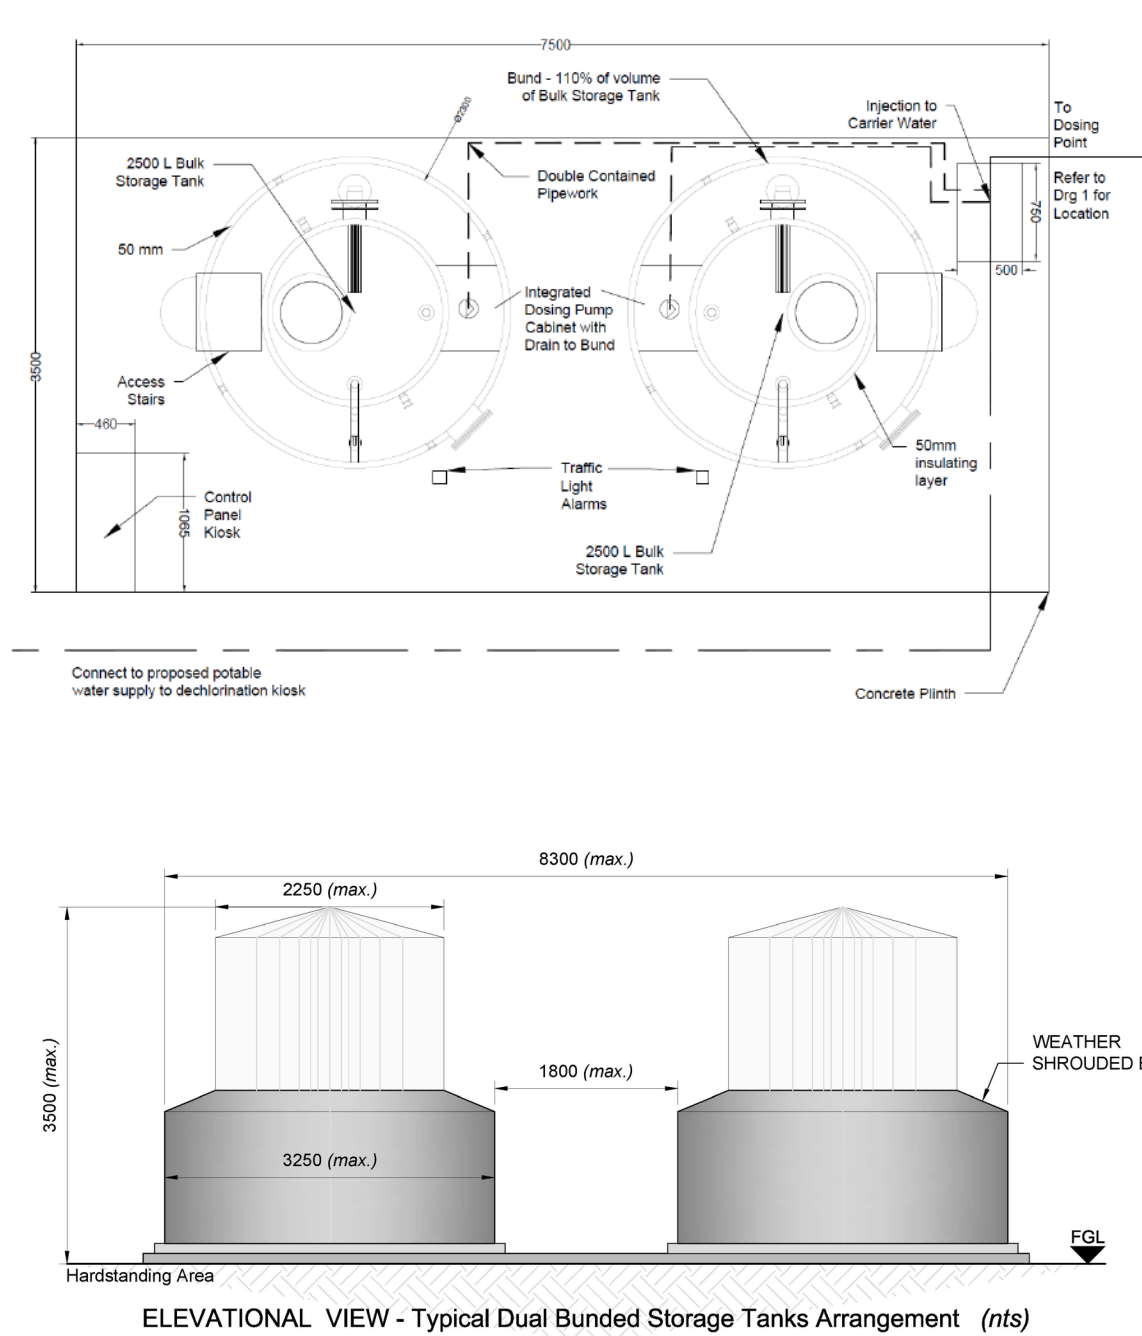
Plan and Elevation Drawings of a typical Orthophosphate Dosing Unit
